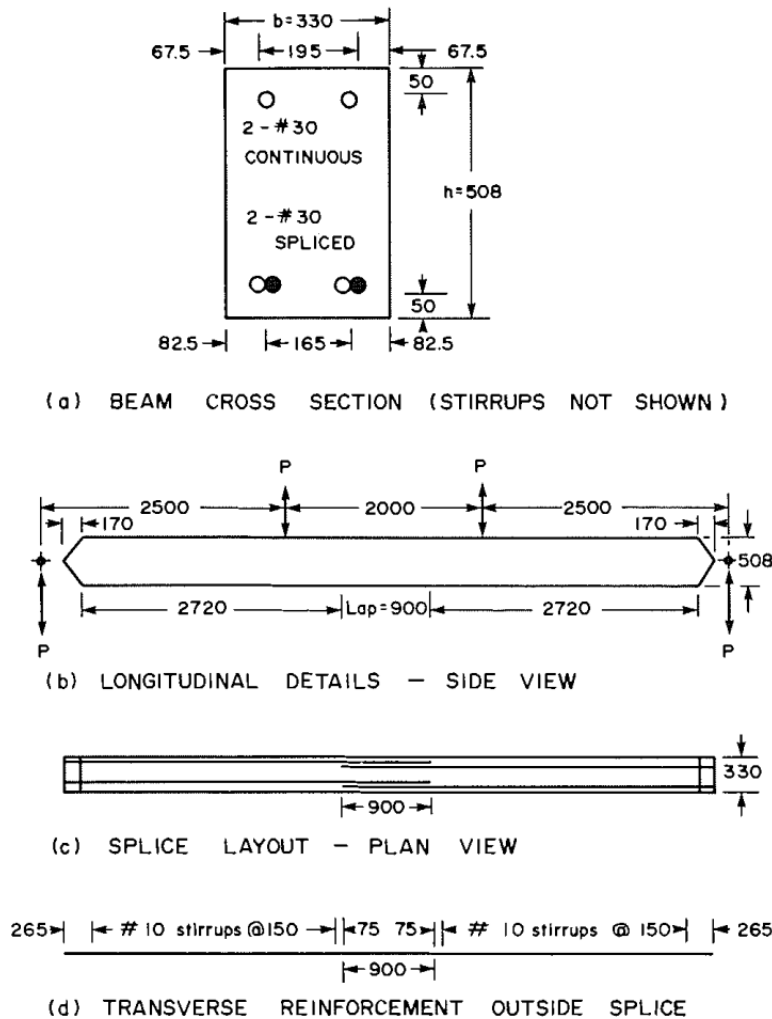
Beam specimens detail (Sparling & Rezansoff, 1986)
